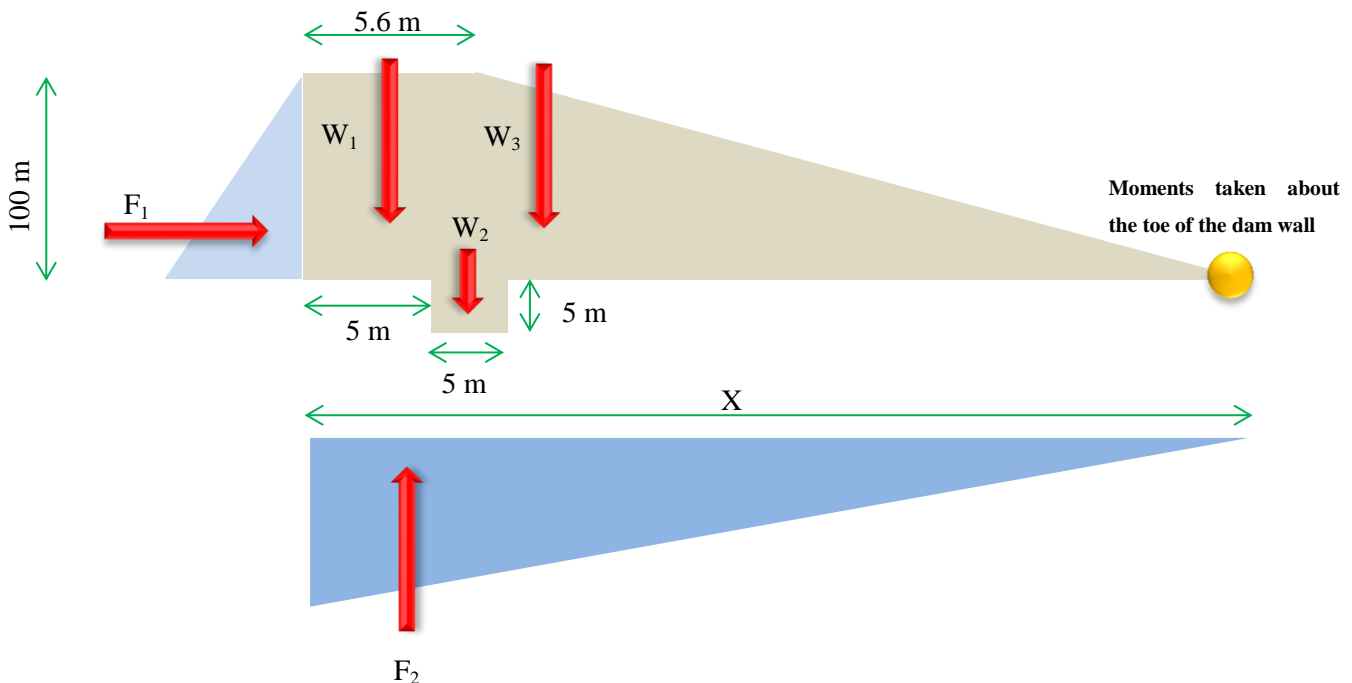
Schematic section of a dam wall used to calculate the downstream slope of the hydraulic structure
